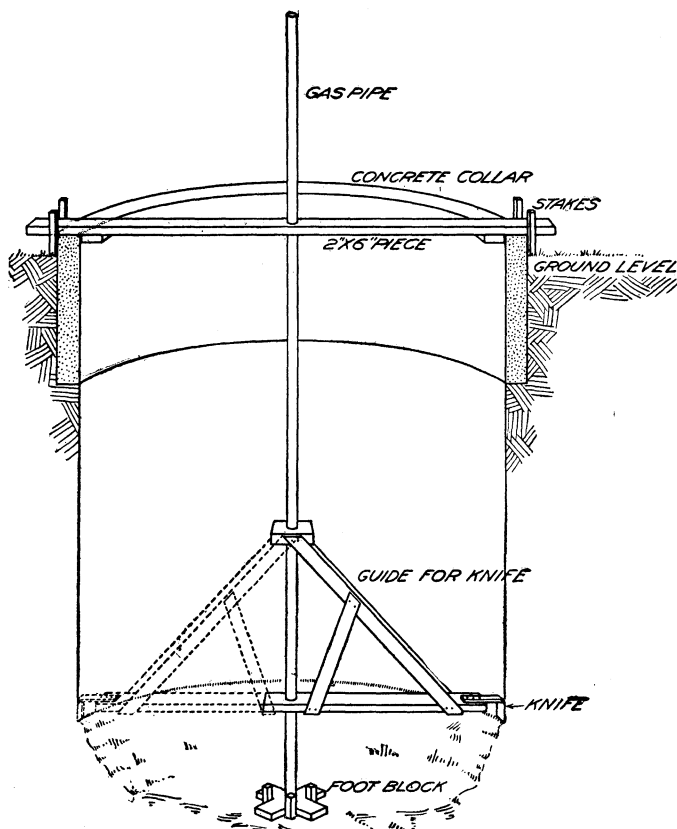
Vertical section of a pit silo, showing device for keeping the walls smooth and plumb.
